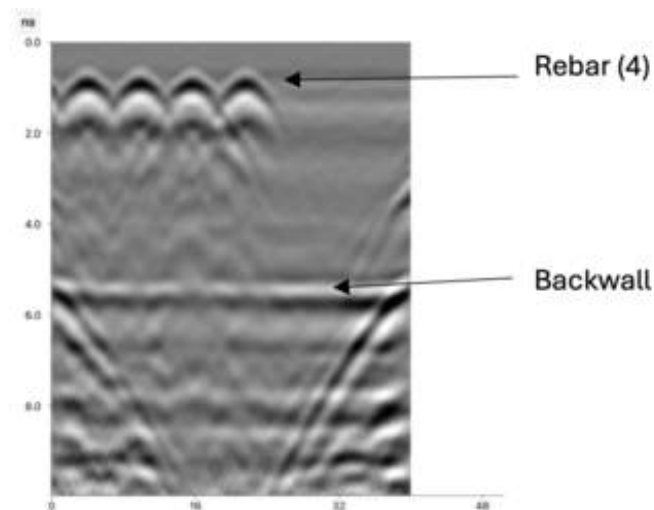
Typical GPR image, called radargram, with rebar and backwall
